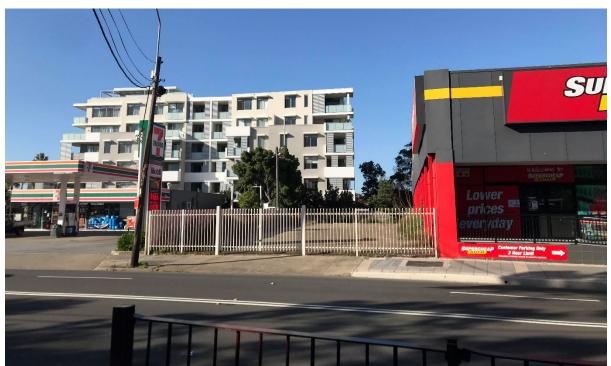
Site viewed from Liverpool Road. Flat building at No. 1-7 Victoria Street can be seen in the background.
